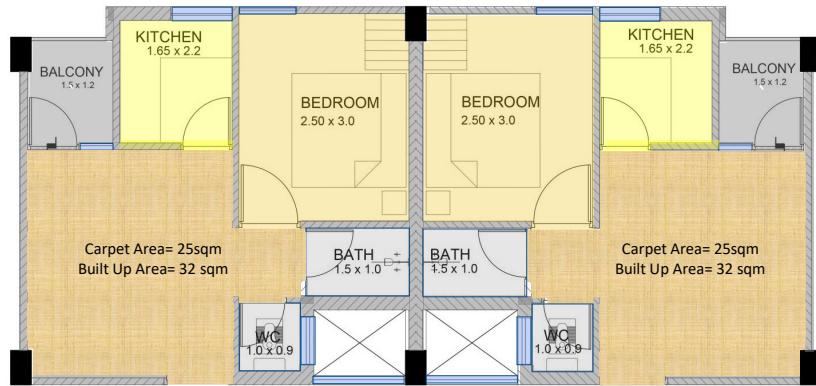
FIG: UNIT PLAN OF IN-SITU REDEVELOPMENT AT DISTRICT CENTRE, DILSHAD GARDEN
